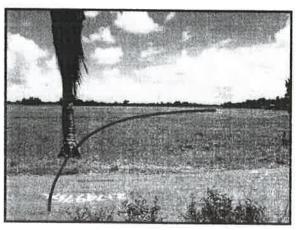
Taken at Sta. 2+749.75 in Brgy. Cutcut, Guiguinto alignment going towards Brgy. Bulihan, Plaridel, Bulacan (looking north).
